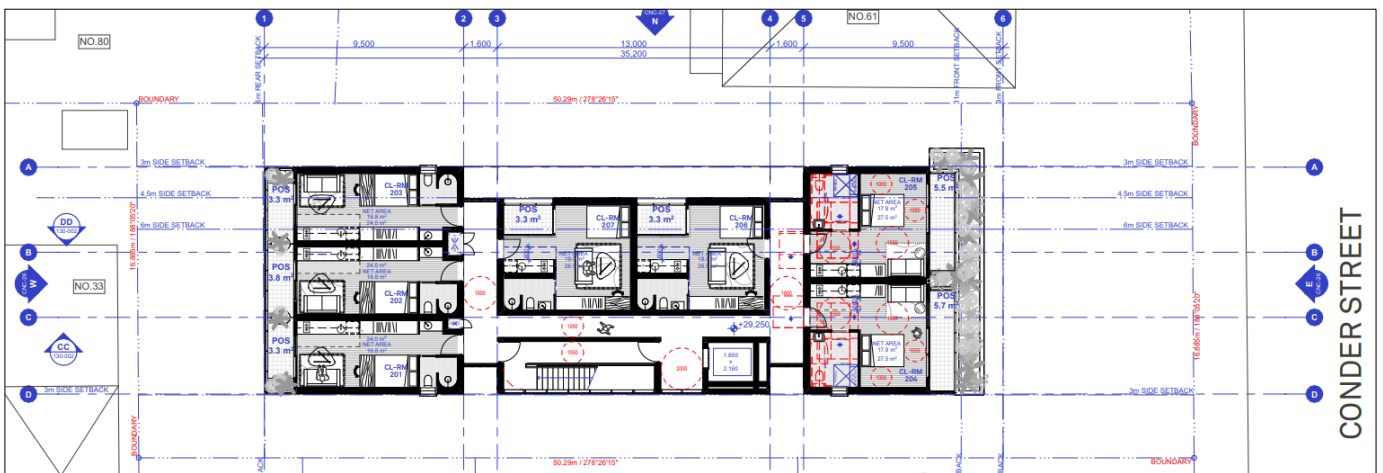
(above) Amended Top floor (Level 2) Plan submitted by the applicant. Source: Benson McCormack (2026).
